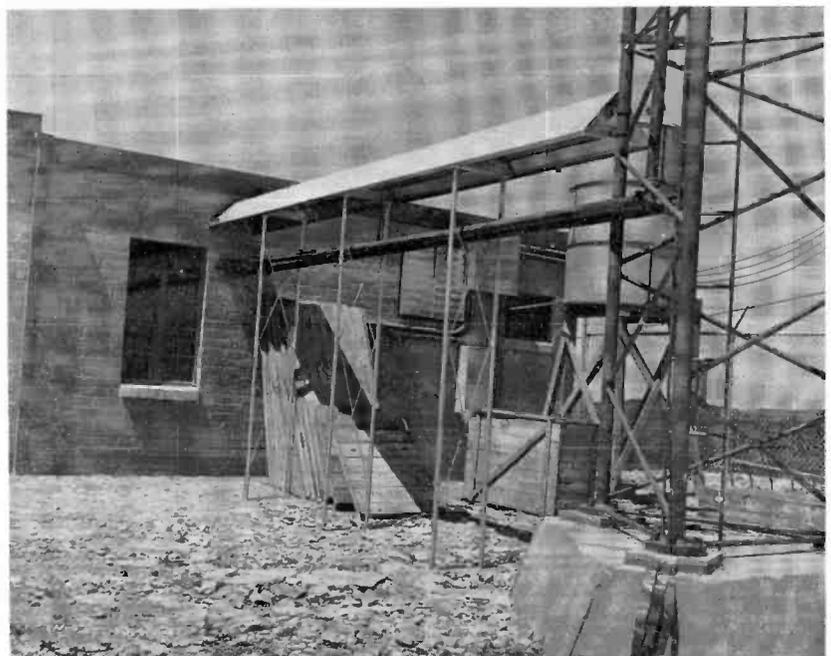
Microwave studio-transmitter link. Photo shows parabolic receiving antenna on transmitter building roof. Transmitting antenna is mounted on Driskill Hotel roof—studio location in downtown Austin.
